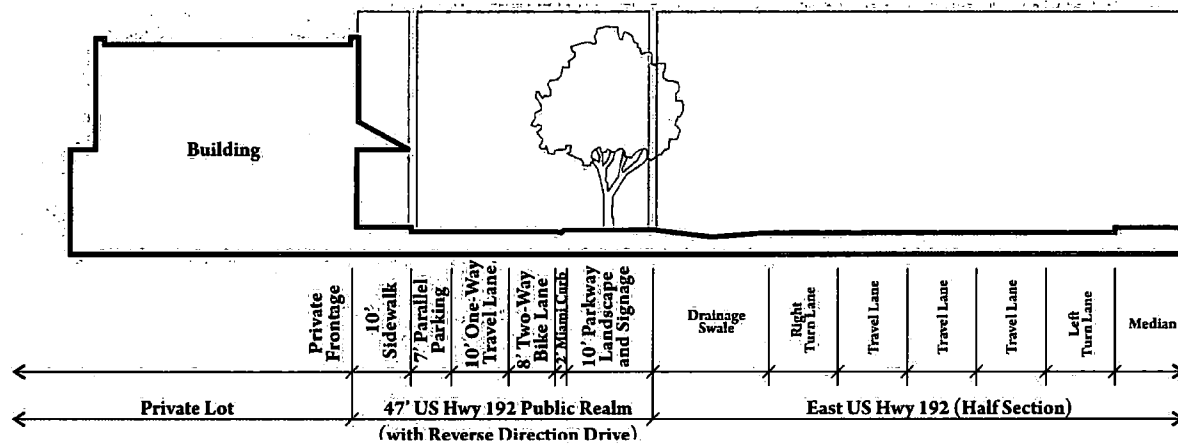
below, depicts the Streetscape’s design elements of the U.S. Hwy 192 Public Realm proposed along the U.S. Hwy 192 frontage within the CRA, which consist of a landscape and signage parkway, a mountable curb, an eight foot (8’) two-way bicycle lane, a reverse direction public parking drive, a seven foot (7’) parallel parking isle, a ten foot (10’) pedestrian sidewalk and the private frontage.
